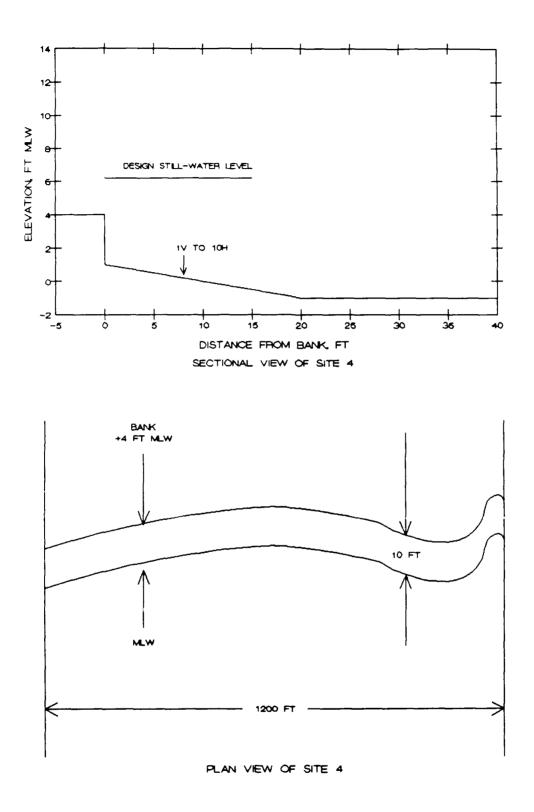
SECTIONAL AND PLAN VIEWS OF SITE 4
